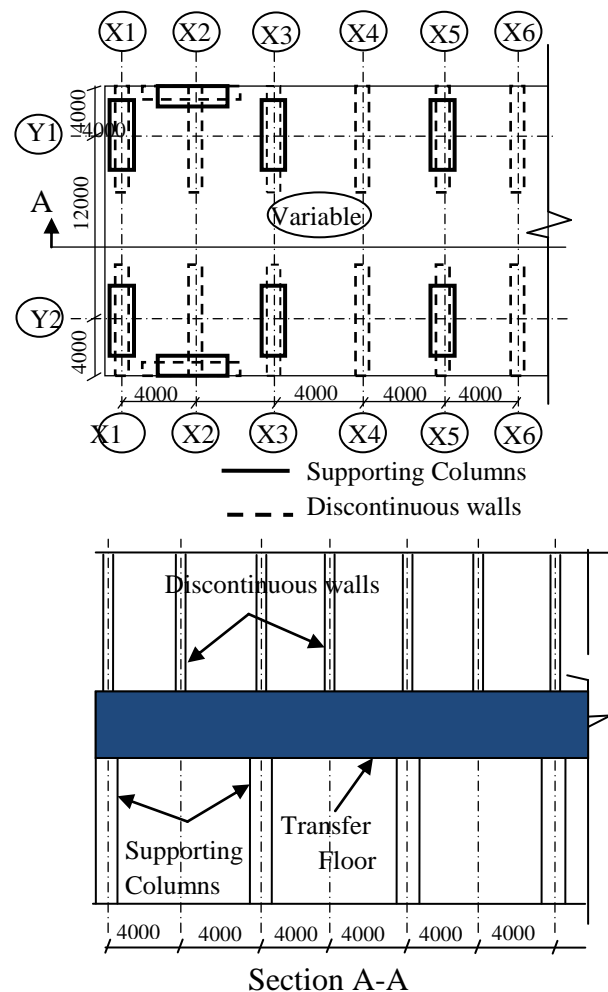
Typical transfer floor plan and cross section (transfer slab system).
